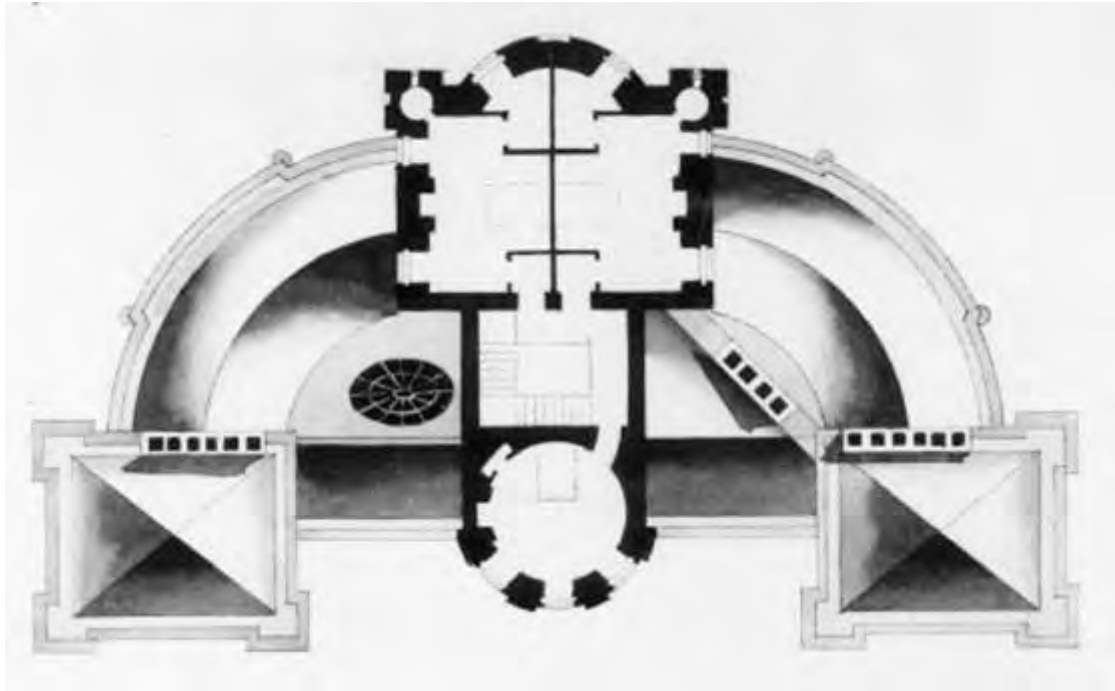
Plan of attic and roof, Robert Adam c1791 *SJSM
